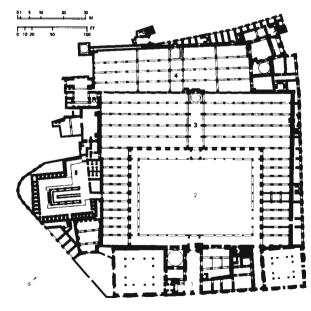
On plan the walls resolved into arches are the dominant feature... El-Azhar Mosque, Cairo (Eqypt), c. 970
